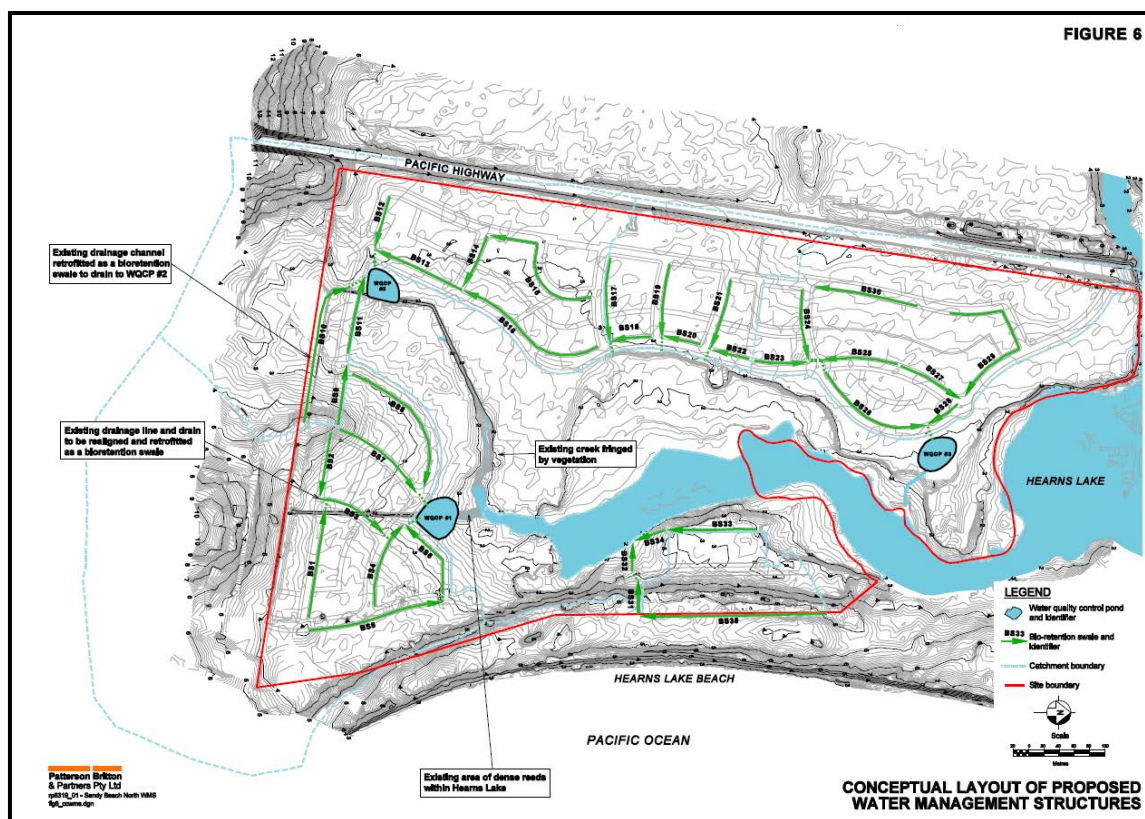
Conceptual Layout of Proposed Water Management Structures.
